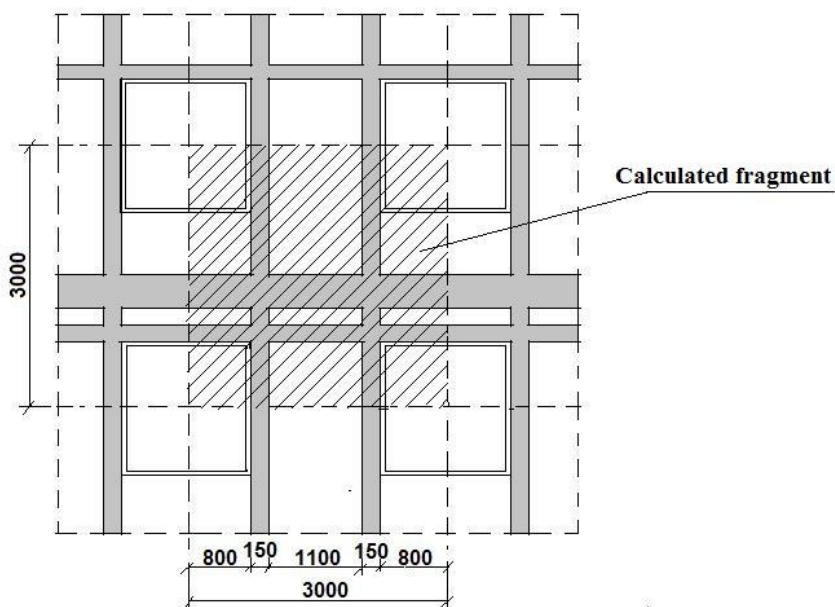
Scheme of the calculated fragment of the wall of a residential building
